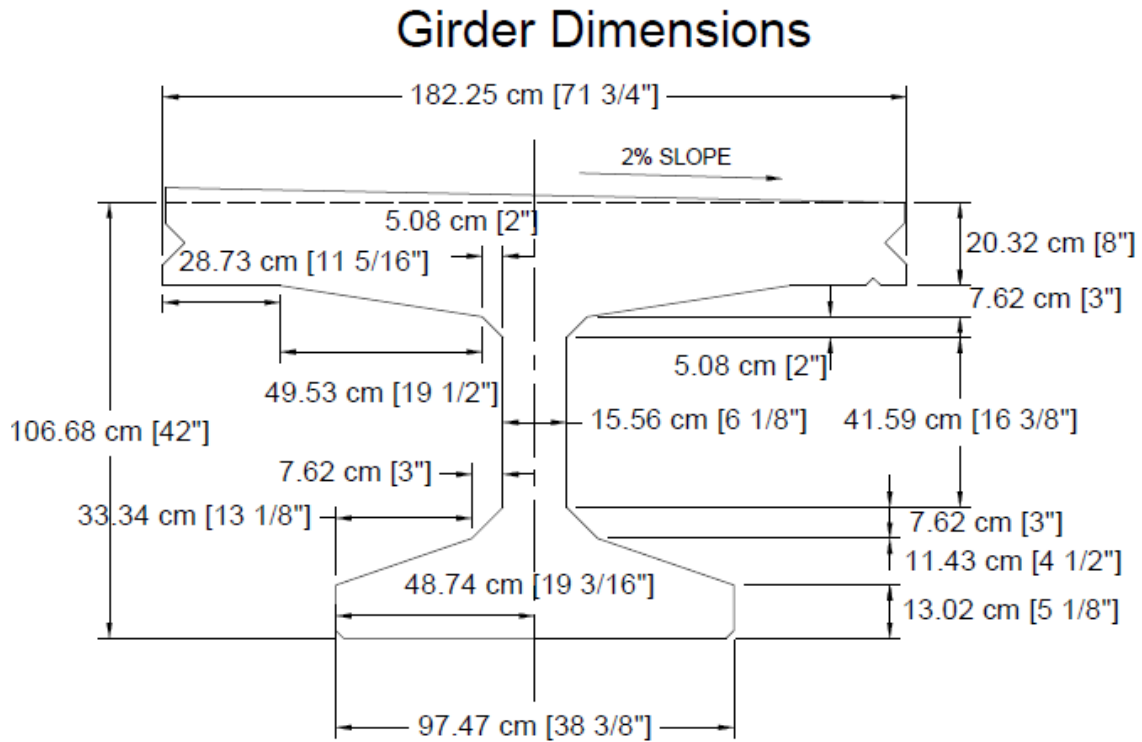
Construction Dimensions of a Typical Girder (Ethan Pickett, personal communication, Feb. 21, 2017)
